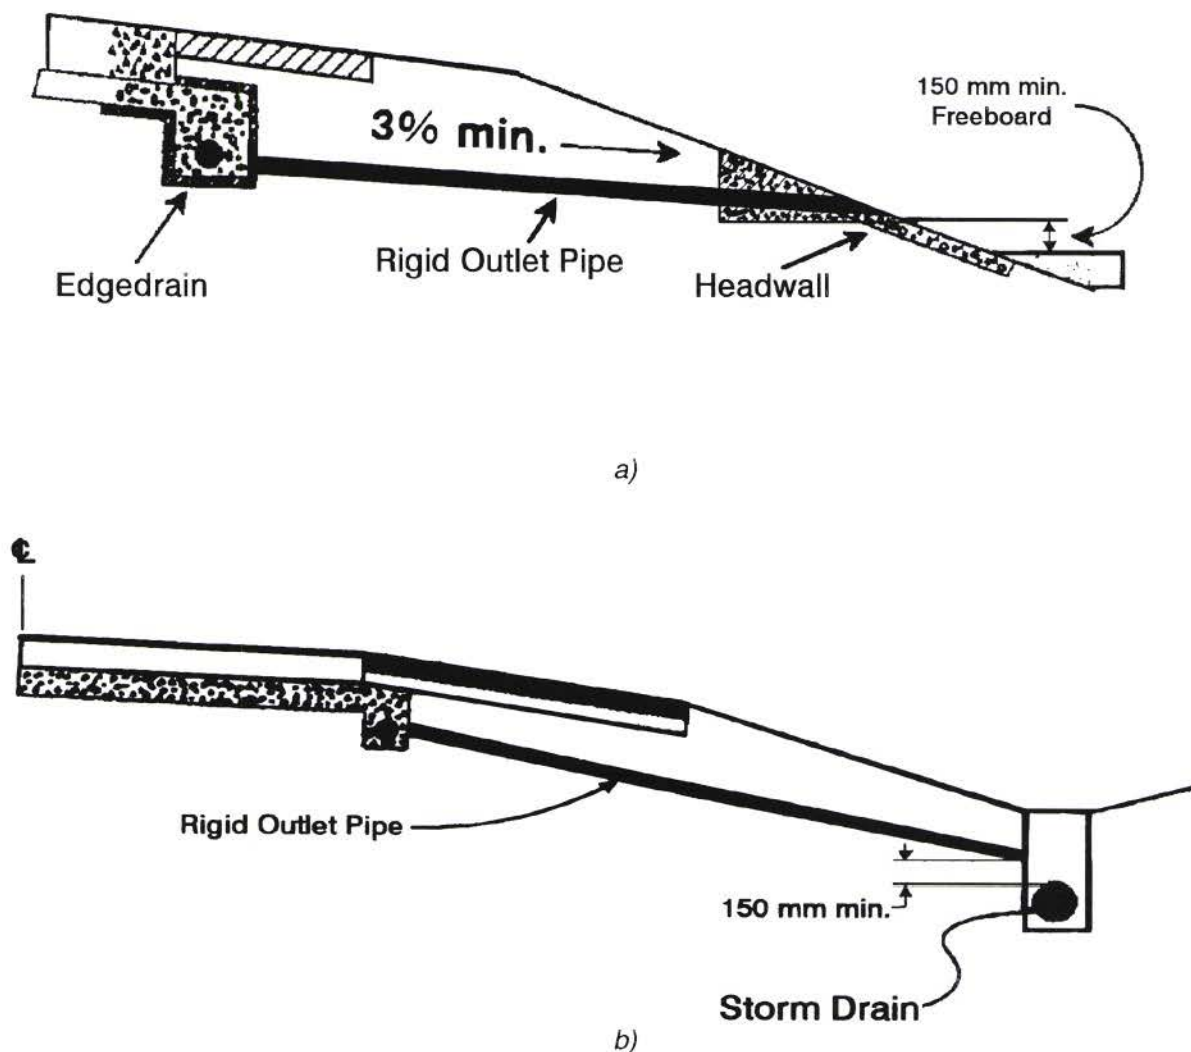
Location of outlet pipe (FHWA 1992): (a) flowing into drainage ditch; (b) connected to storm drain.
